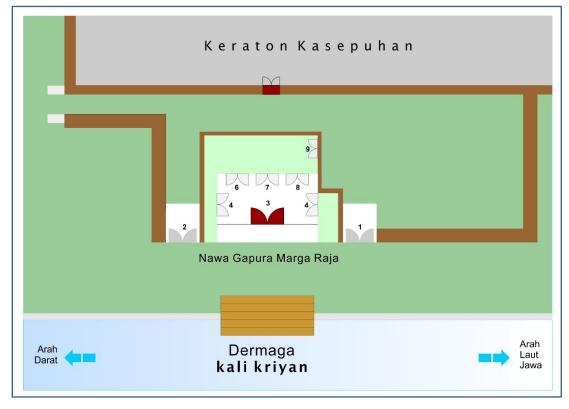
Nawa Gapura Marga Raja/Lawang Sanga floor plan
